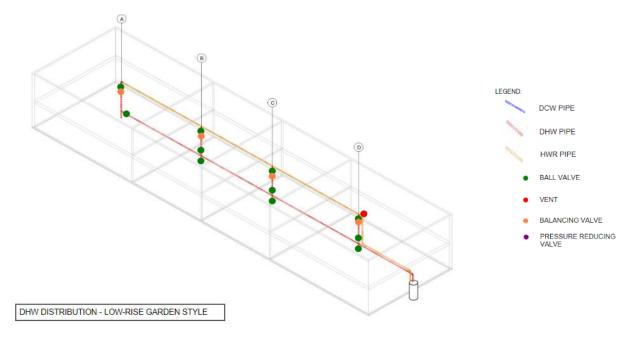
Low-rise garden style domestic hot water piping schematic with appurtenance locations.
